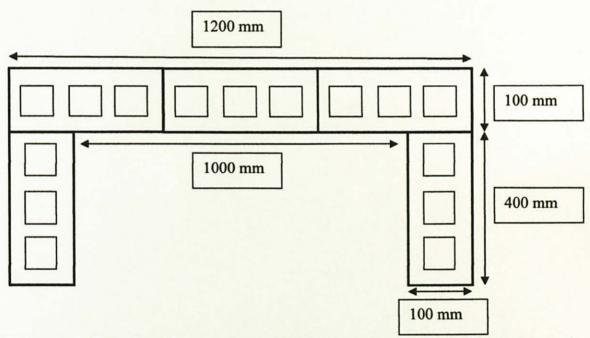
Plan view of the prototype crumb rubber noise barrier wall without crumb rubber filler but with side wall
